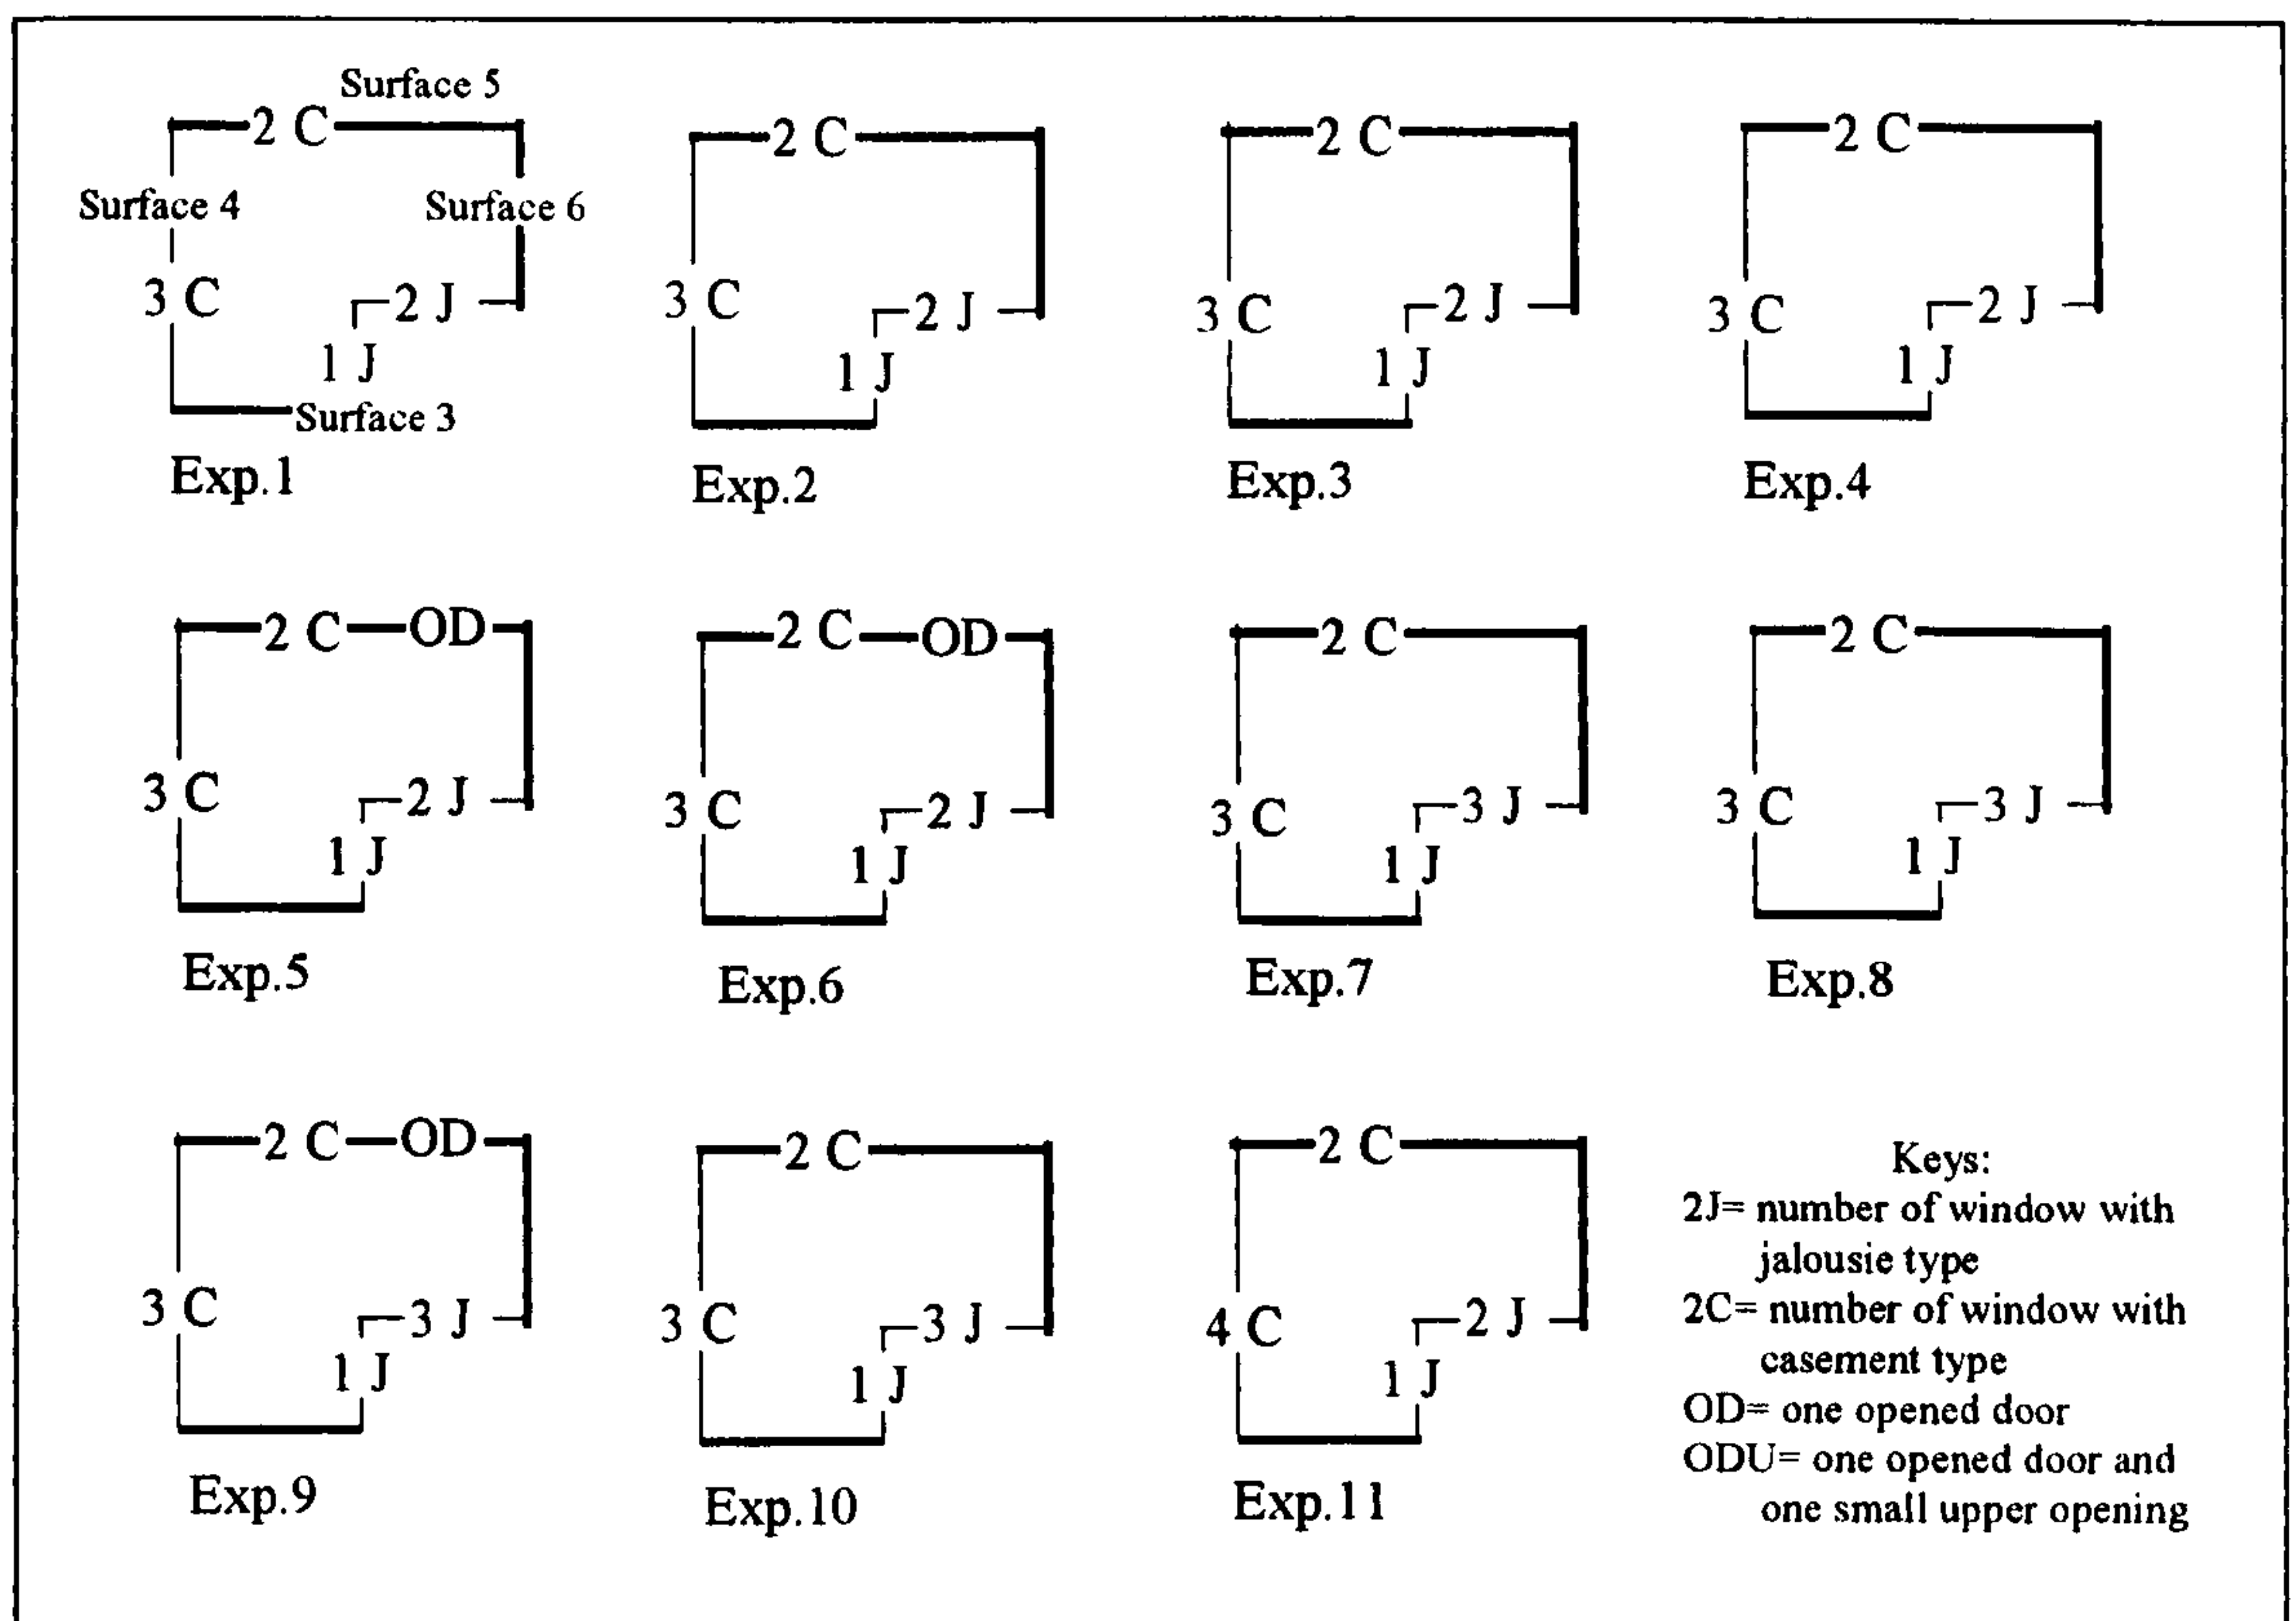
Detailed sketches of house type A for experiments in Table 10.9.
